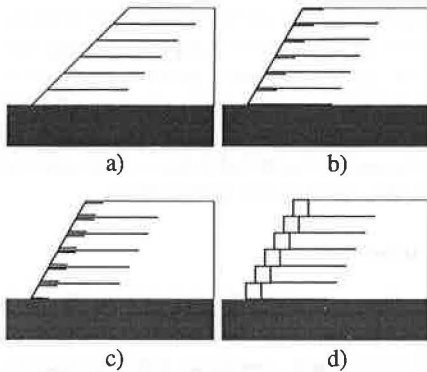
The construction schemes for green faced structures: a) straight reinforcement; b) wrap-around reinforcement; c) mixed scheme; d) face blocks plus straight reinforcement.
